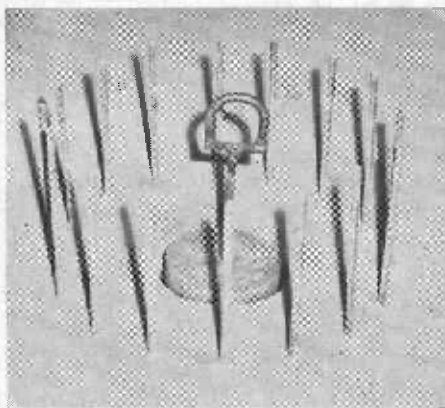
The drain opening in a liquid-manure collection pit under a slotted floor. Metal rods prevent the entrance of objects that might stop up the drain. The concrete drain plug can be lifted with a hook.
